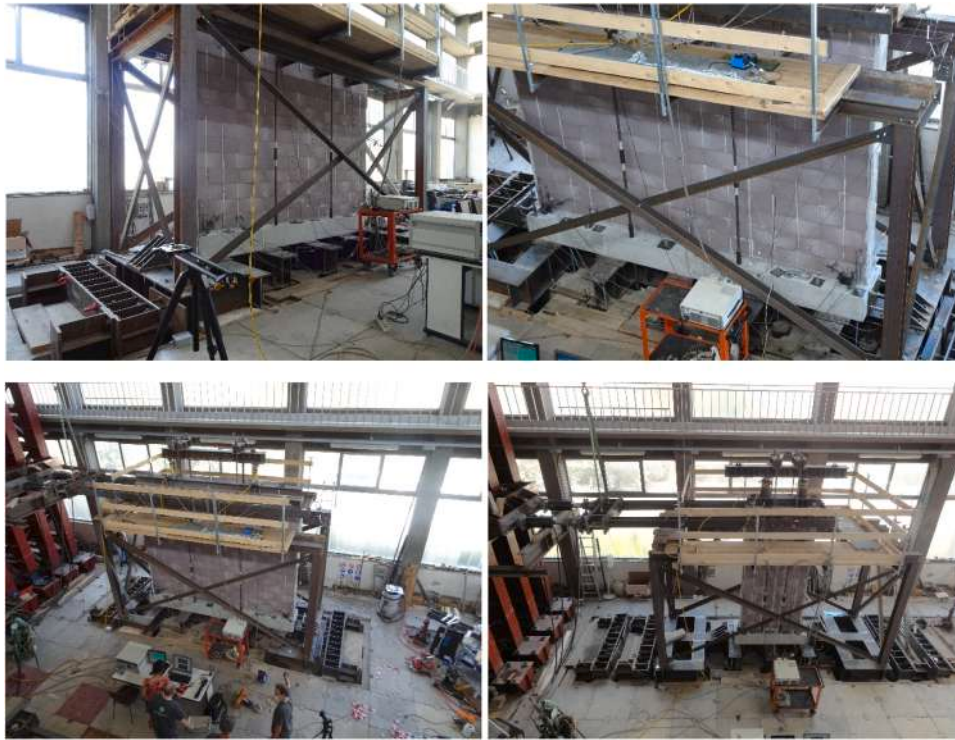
Assembly of the specimen setup on the strong floor of the laboratory of Pisa University (different L/H ratio specimens).
